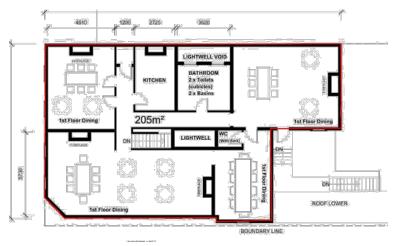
PROPOSED FIRST FLOOR PLAN
